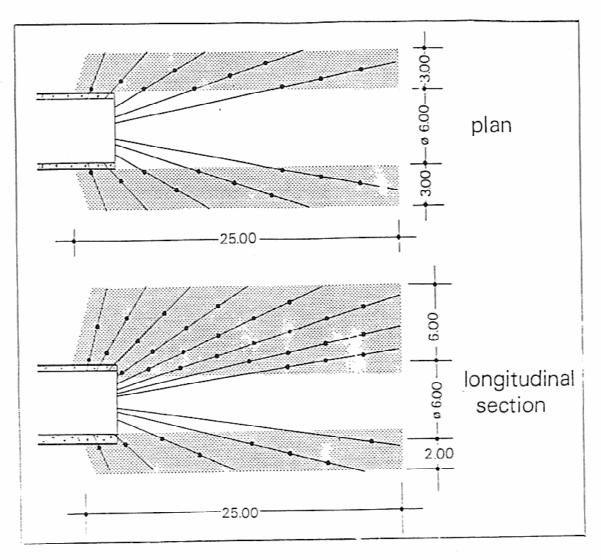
MPSP System for consolidation and reinforcement of microfissured rock above tunnel, Dam C, Asia.
